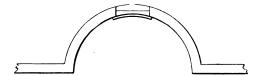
Plan of Concave Wall as Contributed by "R. W. M."
